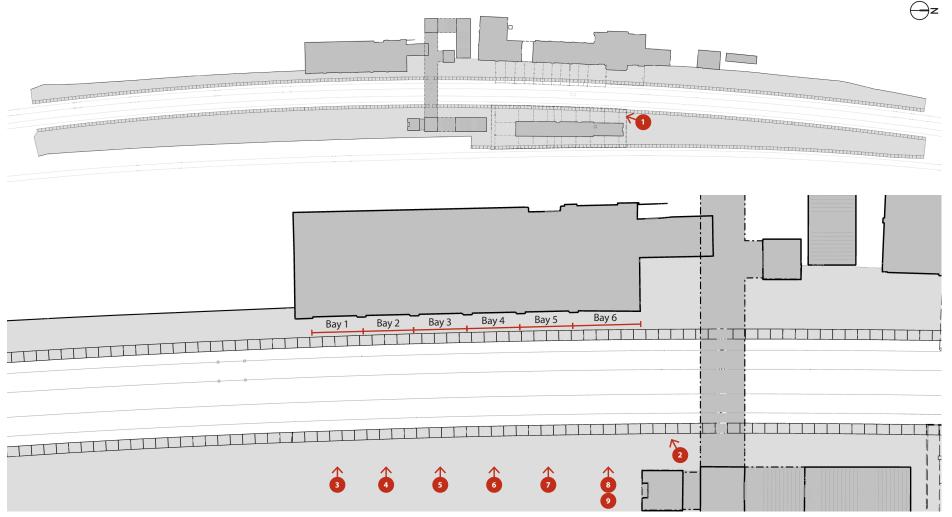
Key plan showing location and direction of photos of the exterior east elevation of Goods Shed
